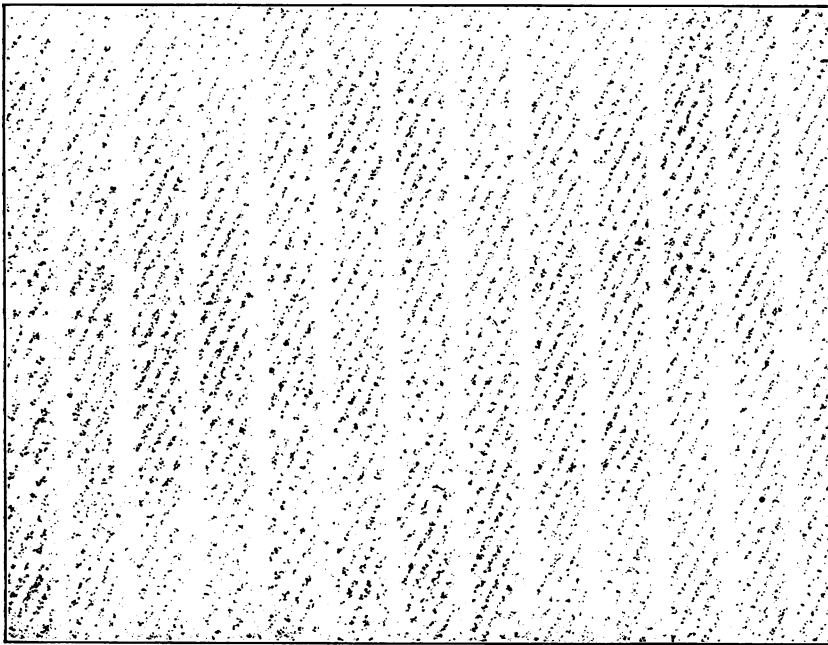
SURFACE OF STONE, FRESHLY DRESSED.
